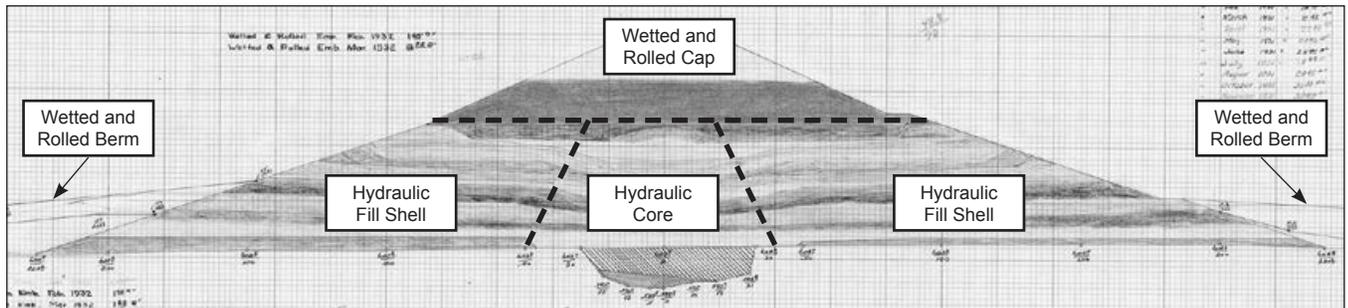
Construction Cross Section of Hydraulic Fill Section (approximate material boundaries indicated) (Main Dam only)
